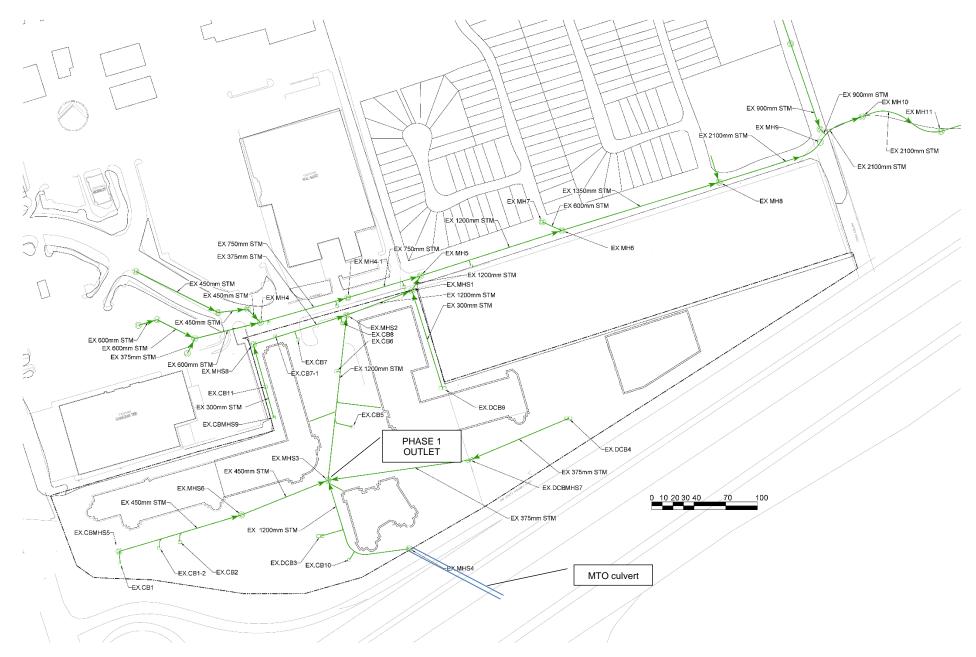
City layout of existing Storm sewers and Site sewers
